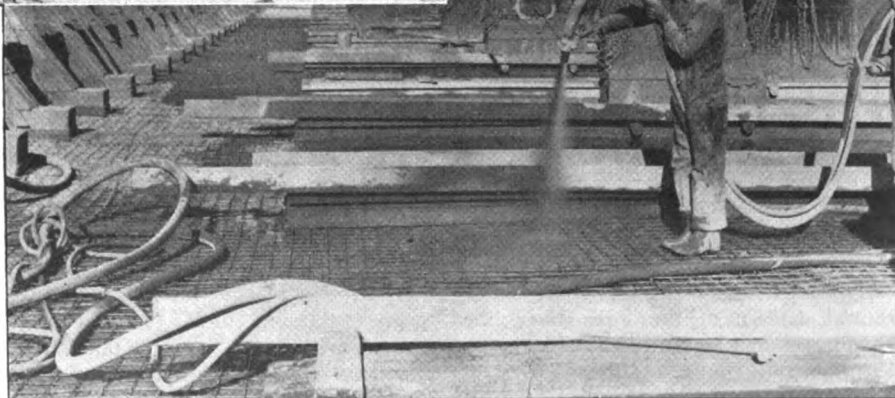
APPLYING COATING TO FLOOR OF DOCK WITH COMPLETED WALL AT RIGHT
